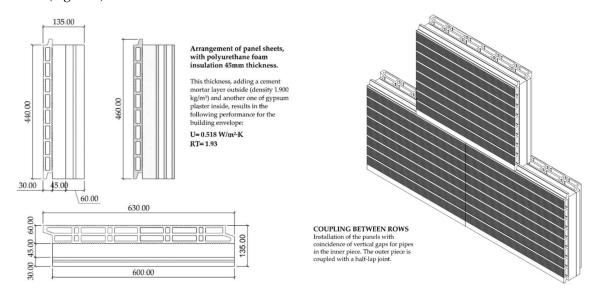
Stabilized soil panels. The total dimensions and blocks' layout.
